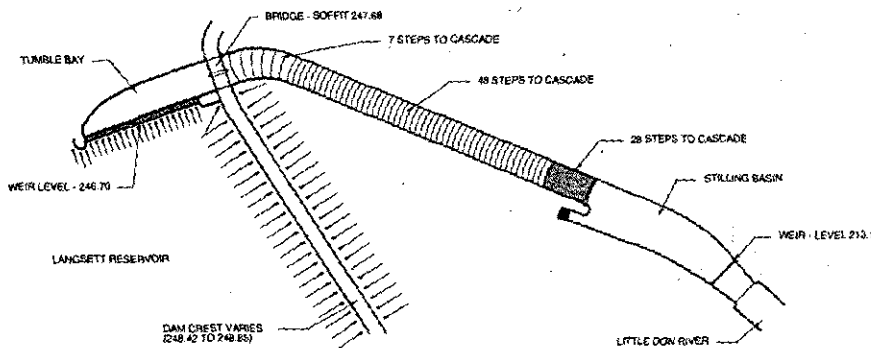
Schematic plan view of the Langsett reservoir spillway
